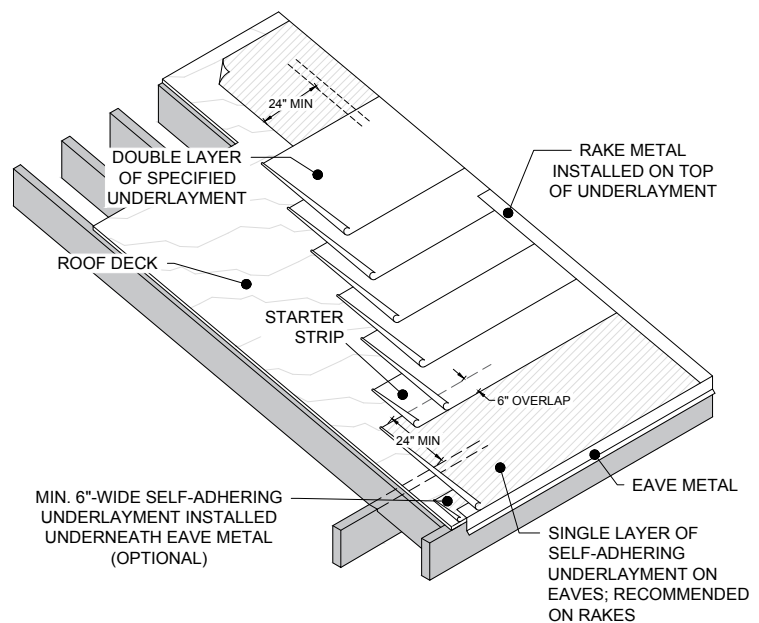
Application of Arctic Seal® for Ice Dam Protection, Roof Slopes 2:12 Up to 4:12
